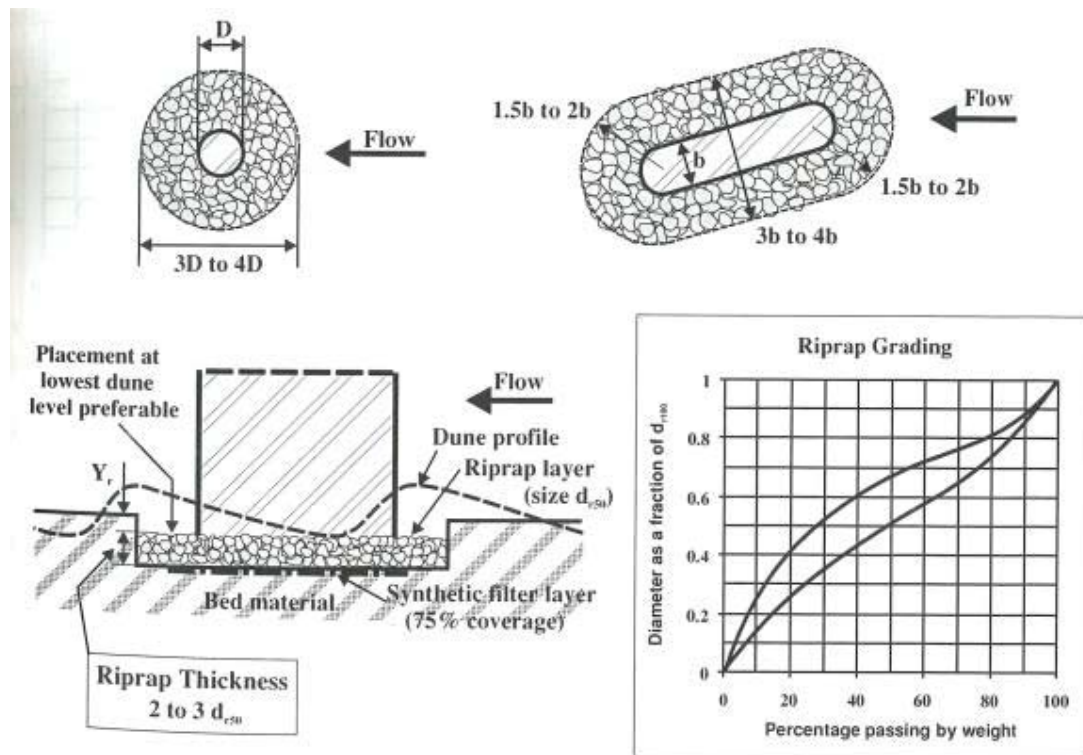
Riprap placement details (Reproduced from Figure 9.33 in Bridge Scour)
